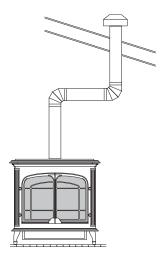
Vertical Venting Through Ceiling Using Two 90° Elbows (Oxford™ Model Shown)
